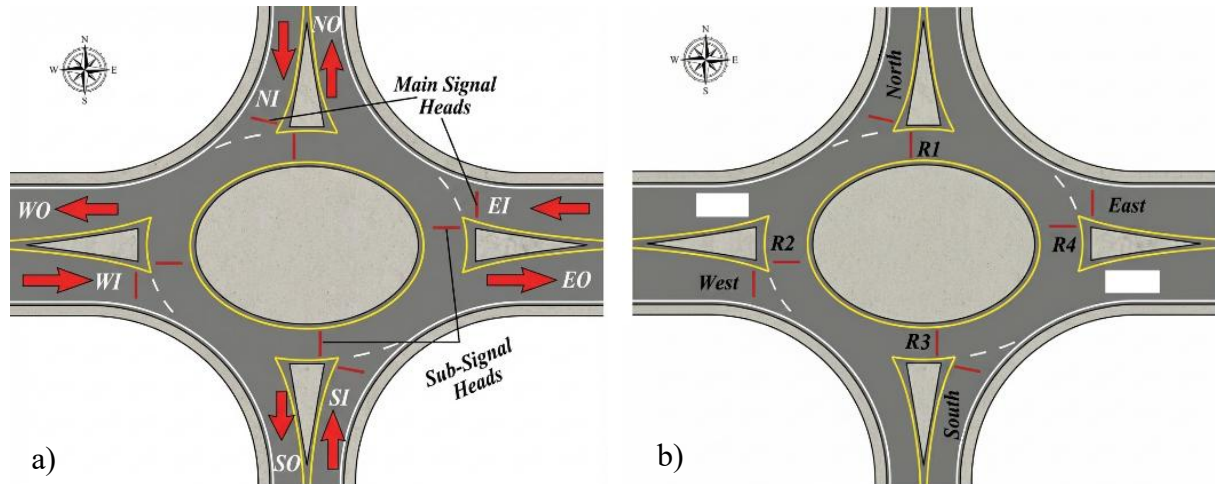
Typical geometry layout of FLTSR, a) geometric layout of approaches and roundabout circulation, b) signal heads' nomenclature.
